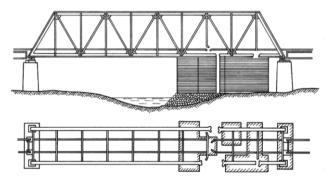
Method of ad hoc reconstruction of a damaged truss with a bottom ride using additional supports constructed as cages from railway sleepers (Miklin & Sawicki, 1993)
